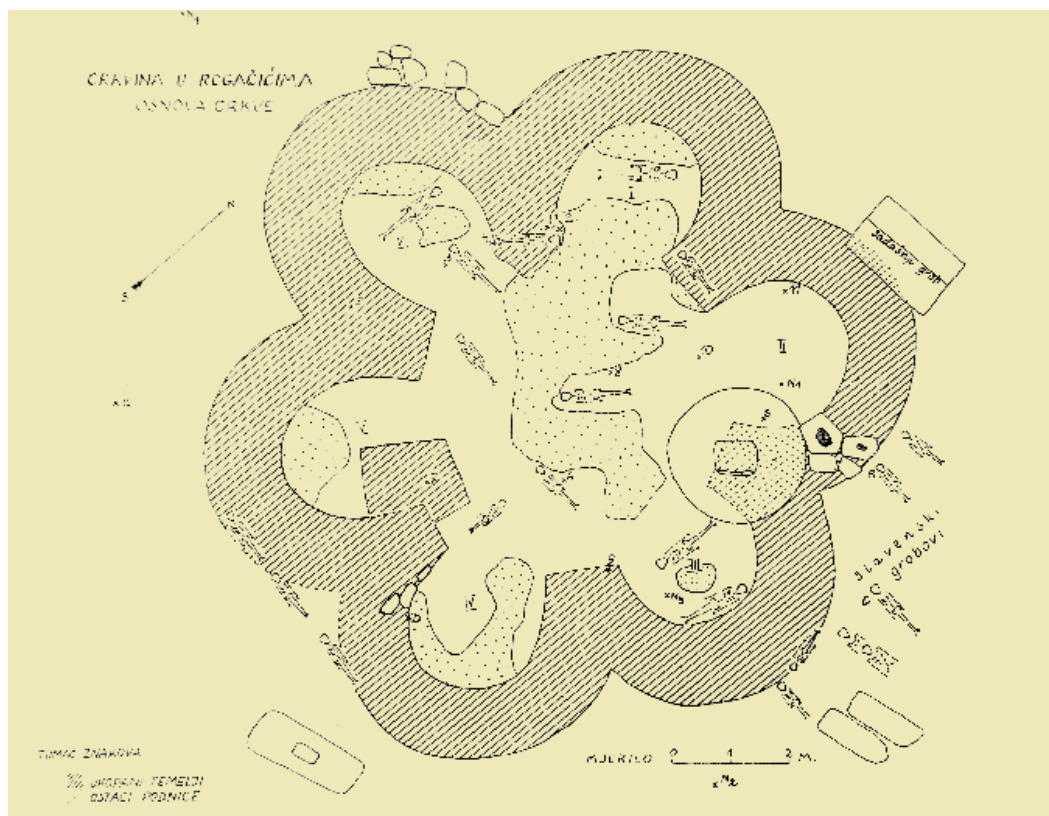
Blažuj, floor plan of the church of St. Blaise, 12th century
